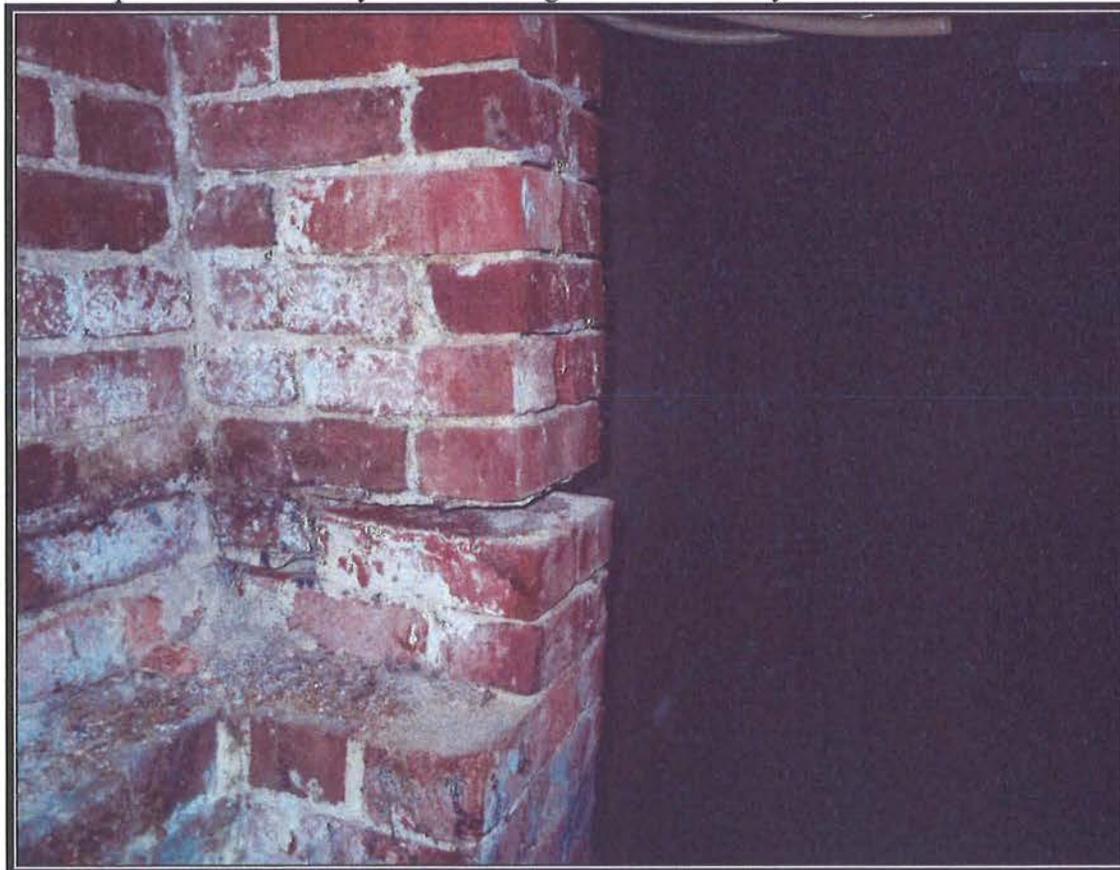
Observe the basement window demonstrating the extent of deformation of the foundation wall.
